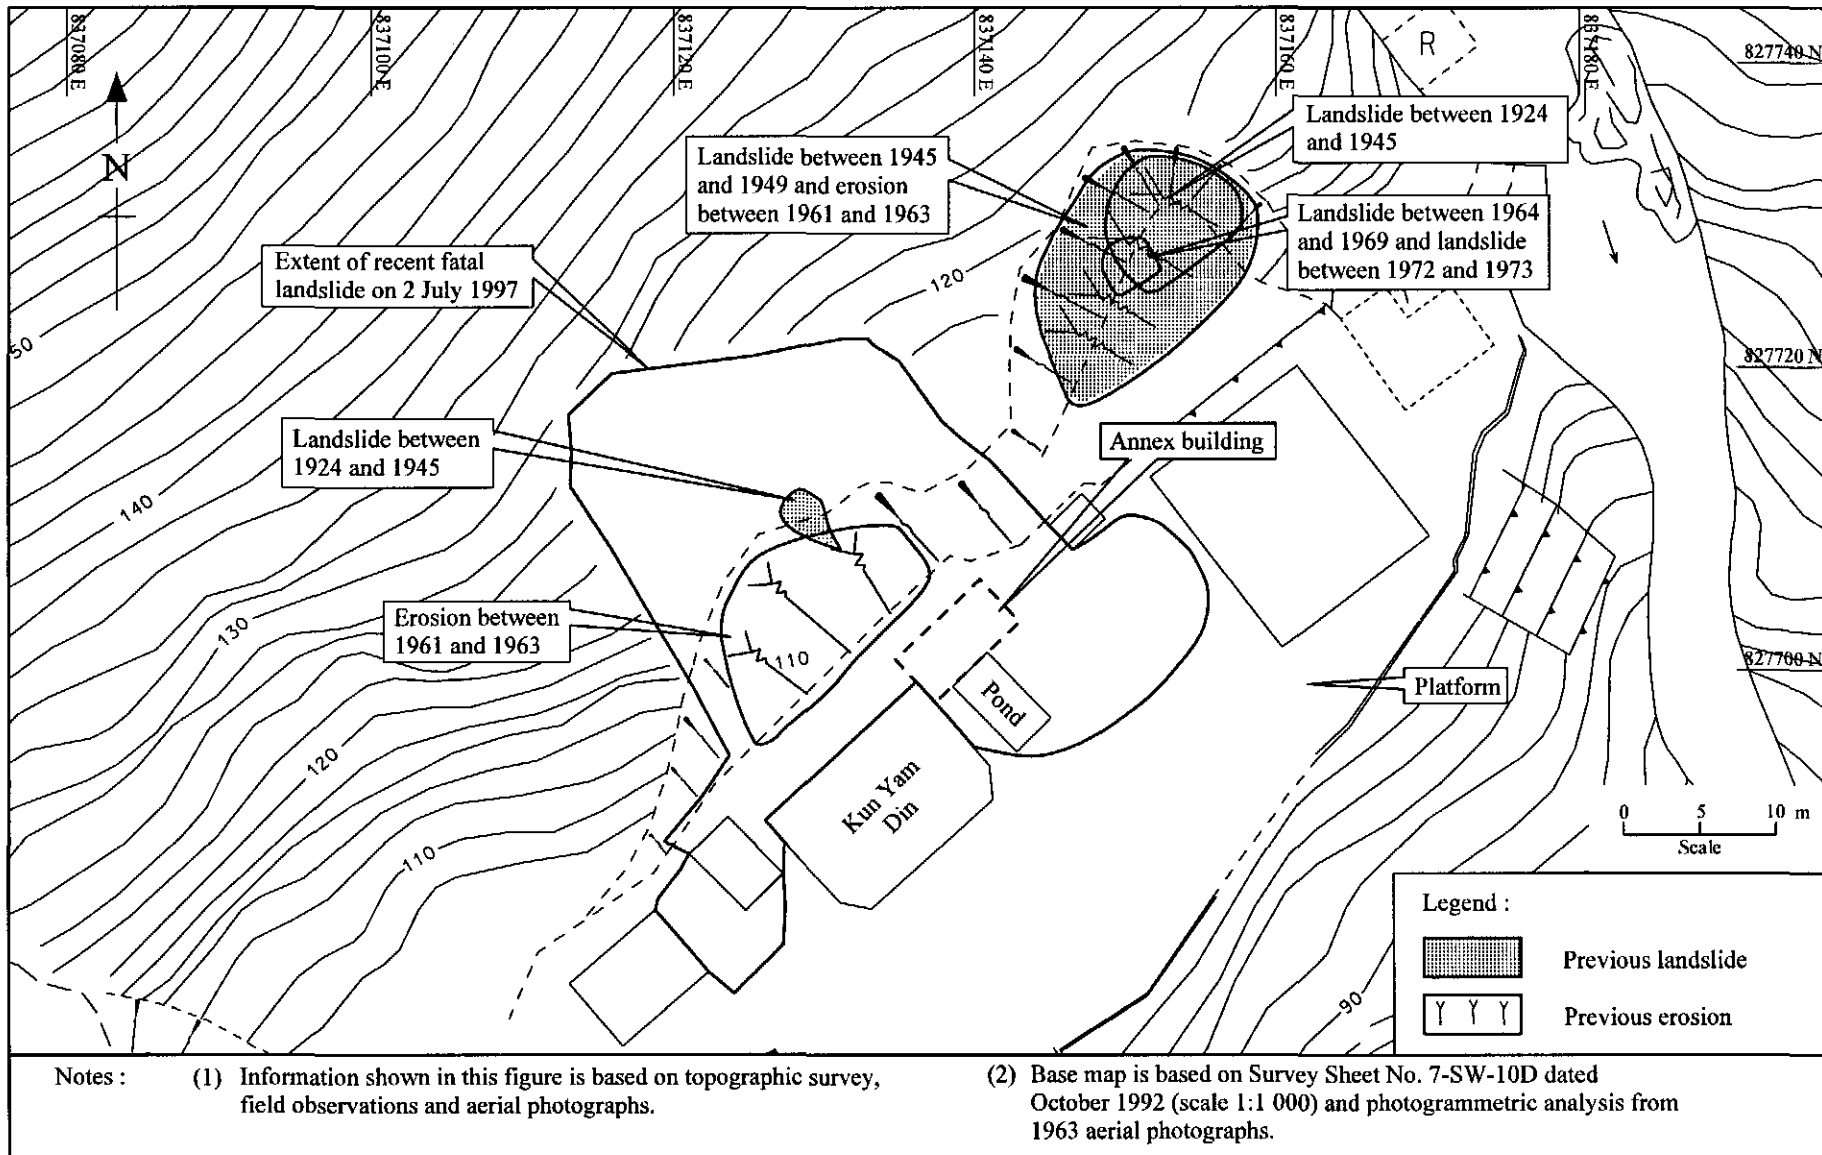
Location Plan of Previous Landslide and Erosion Events
